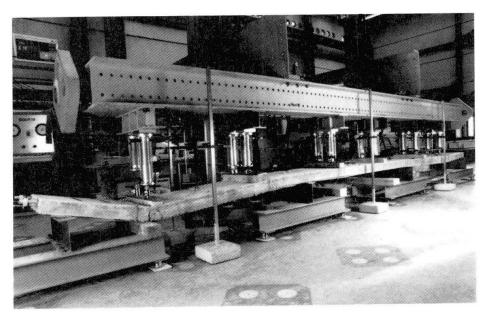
Three span composite slab with embossments, anchorage and negative moment reinforcement after failure.
